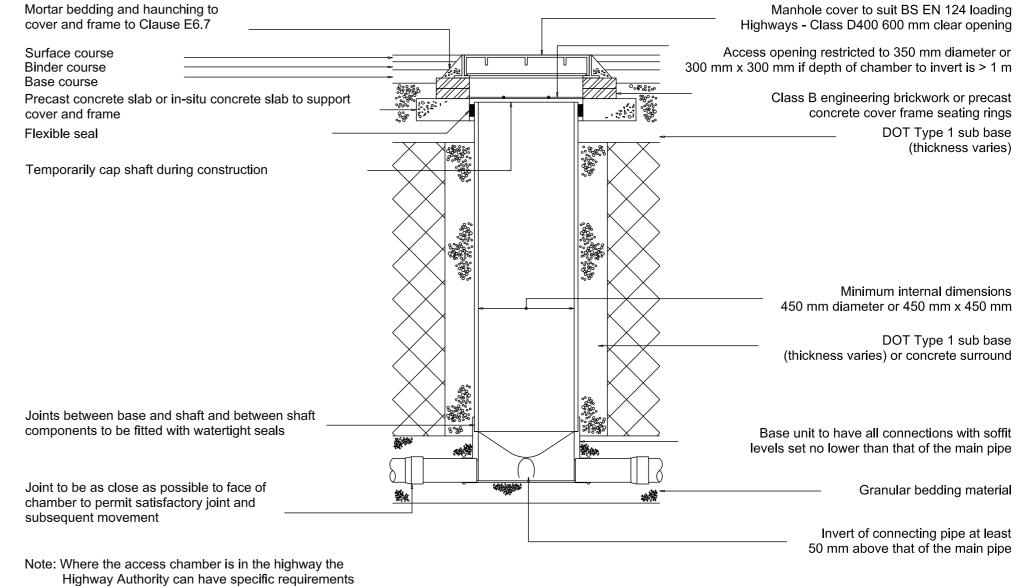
TYPICAL INSPECTION CHAMBER DETAIL - TYPE 3 (Flexible material detail)
